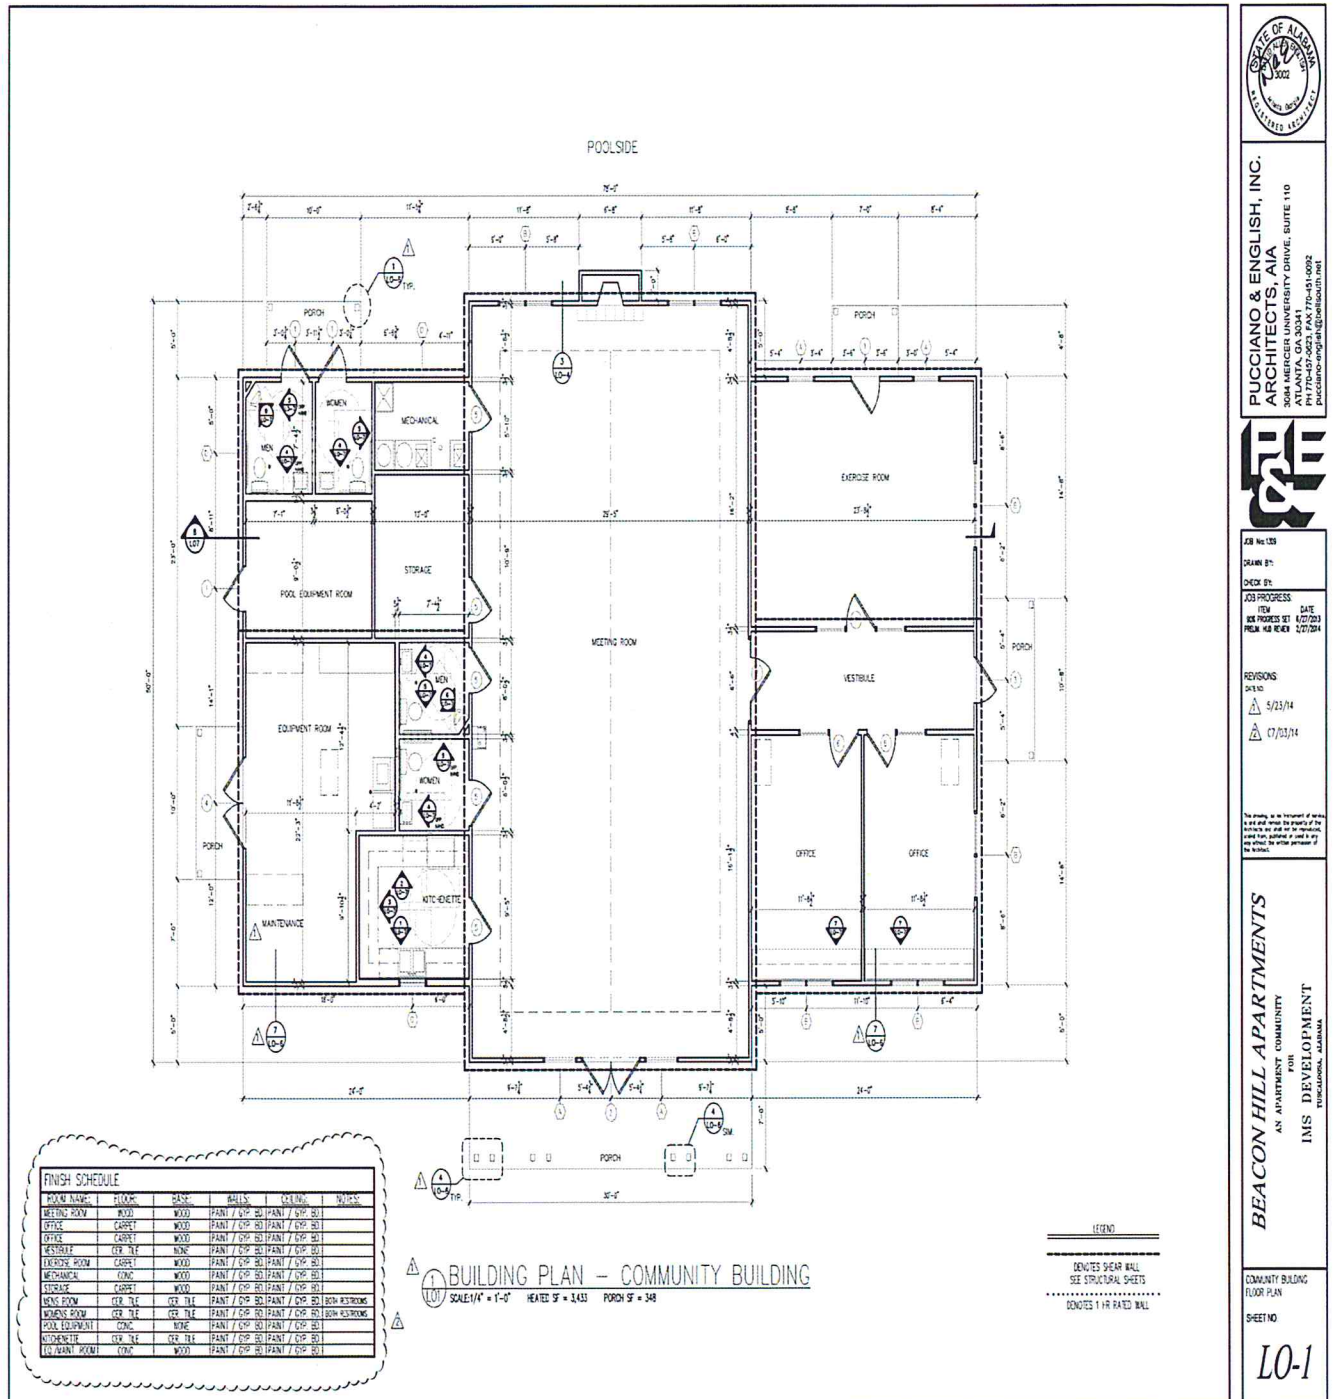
EXHIBIT B: PROPOSED SITE PLAN CONT'D
